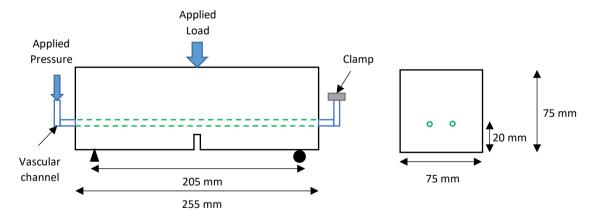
Test set up and specimen dimensions left) elevation and right) cross-section
